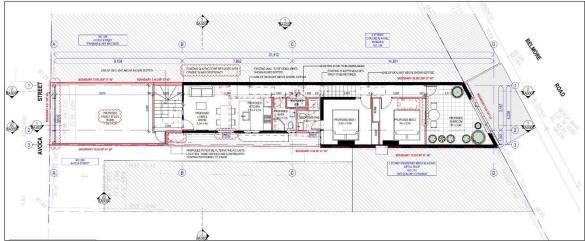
Proposed first floor plan with demolition overlay (Square One Atelier)
